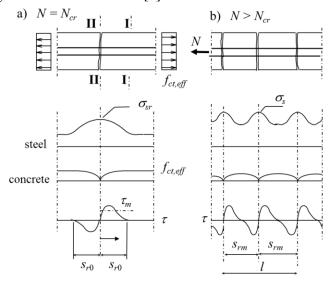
The model of cracking in the reinforced concrete element under tension at the time of the appearance of the first crack (a) and at the stage of stabilized cracking (b) [7]
